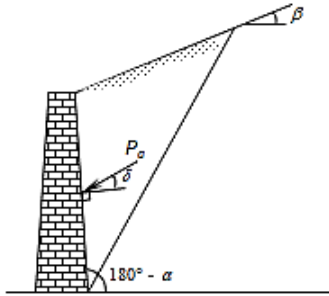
General arrangement of rigid retaining wall and failure wedge
